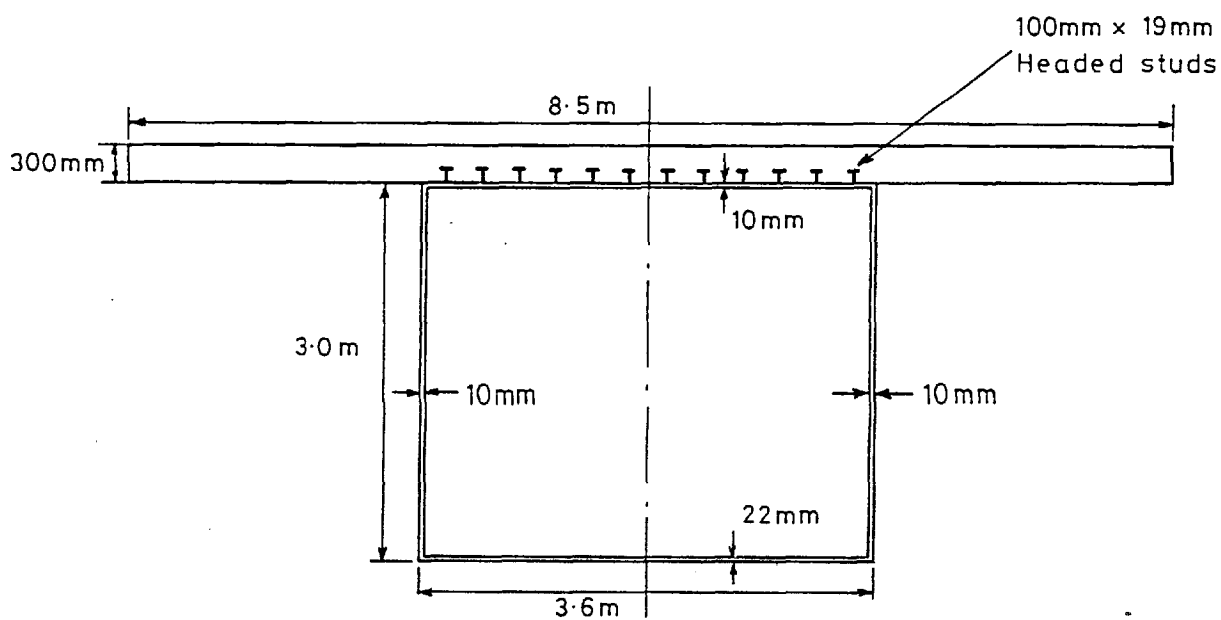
Cross-section of typical closed composite box girder (simplified)
